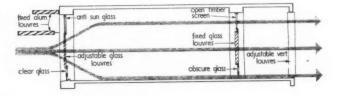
(above, left) and Fig. 7 (above): classrooms open at both sides with counterweighted louvres to deflect air on to the floor. Fig. 8 (left): greater air movement results if the windward openings are smaller than the leeward openings.
